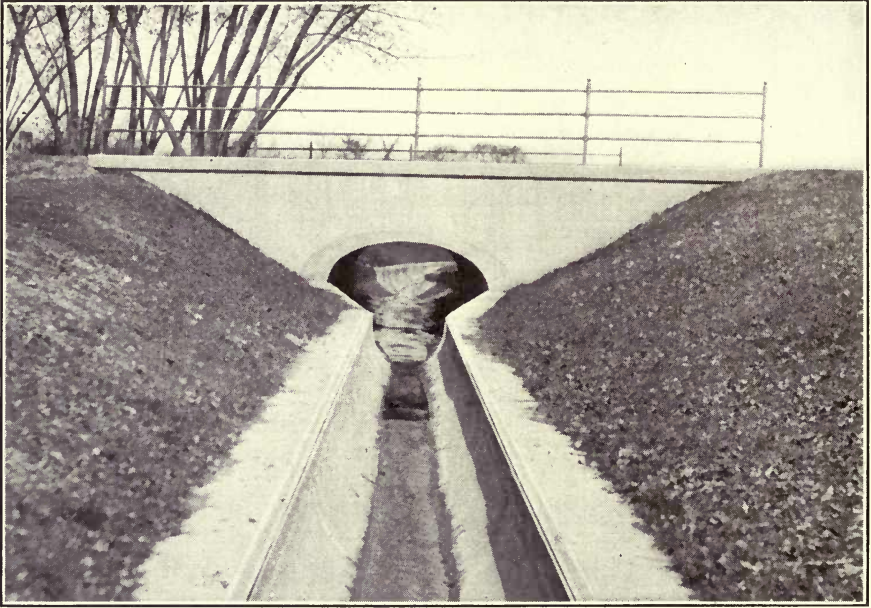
CONCRETE BROOK LINING IN NEWTON, MASS.
